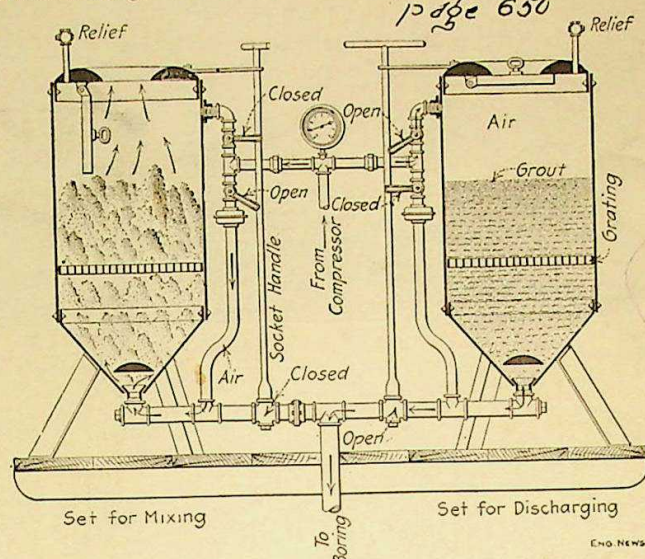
DETAILS OF THE CANIFF GROUTING MACHINE
